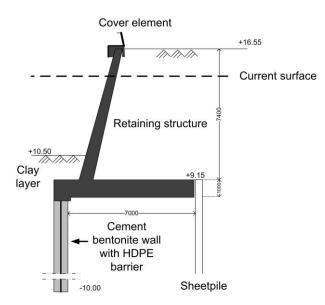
Structure of the retaining wall (after Effing, 2014).
